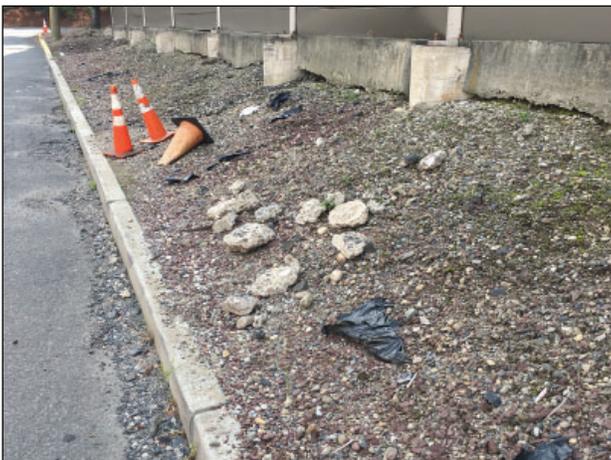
View of wall on Knickerbocker Avenue with sediment and debris falling into the public right of way and street.
